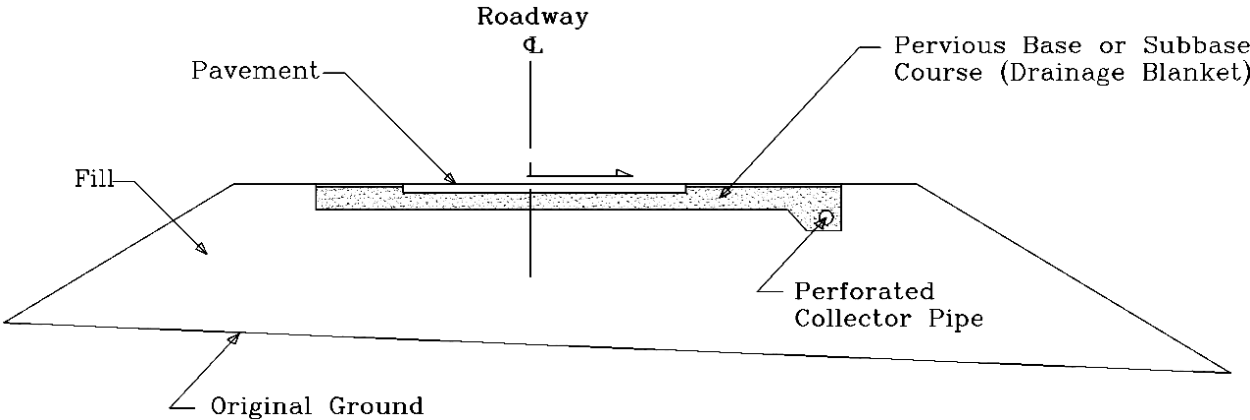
Longitudinal collector drain used to remove water seeping into pavement structural section (redrawn from: Moulton, 1980).
